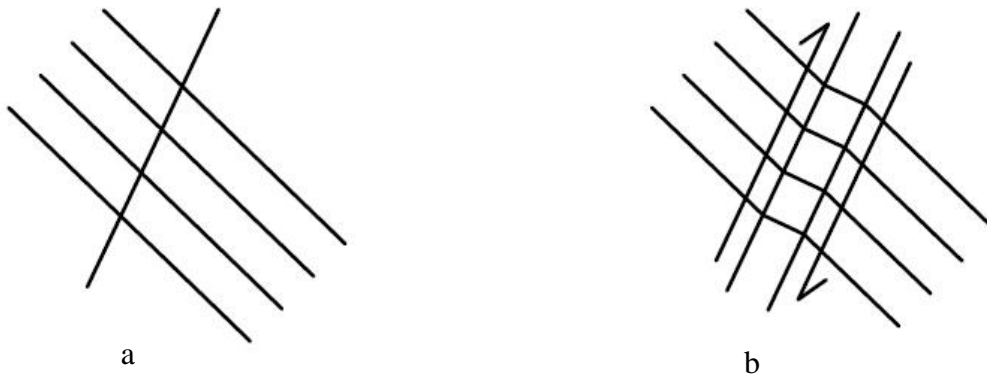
Shear induced in steel from crack opening at an angle to FRP fibre direction: a) crack closed, b) crack open
